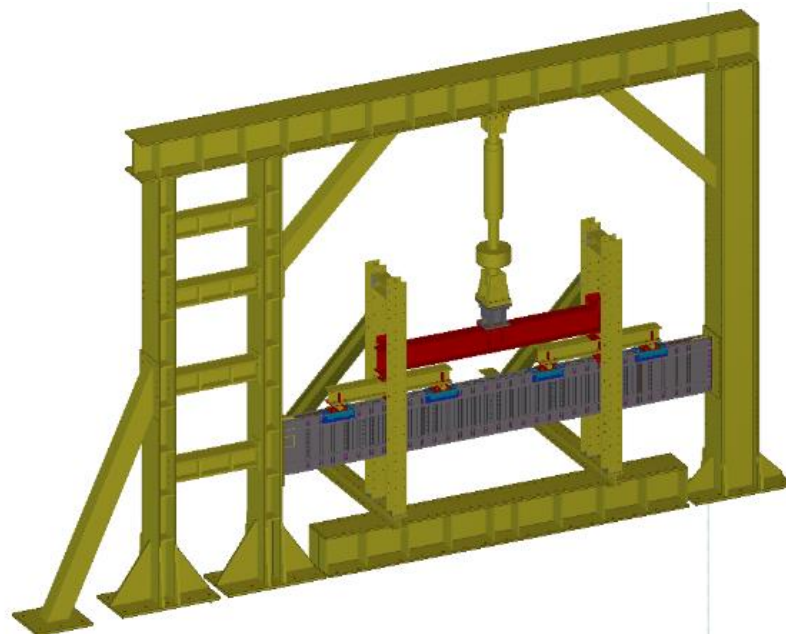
Test setup for welded built-up corrugated web beams
